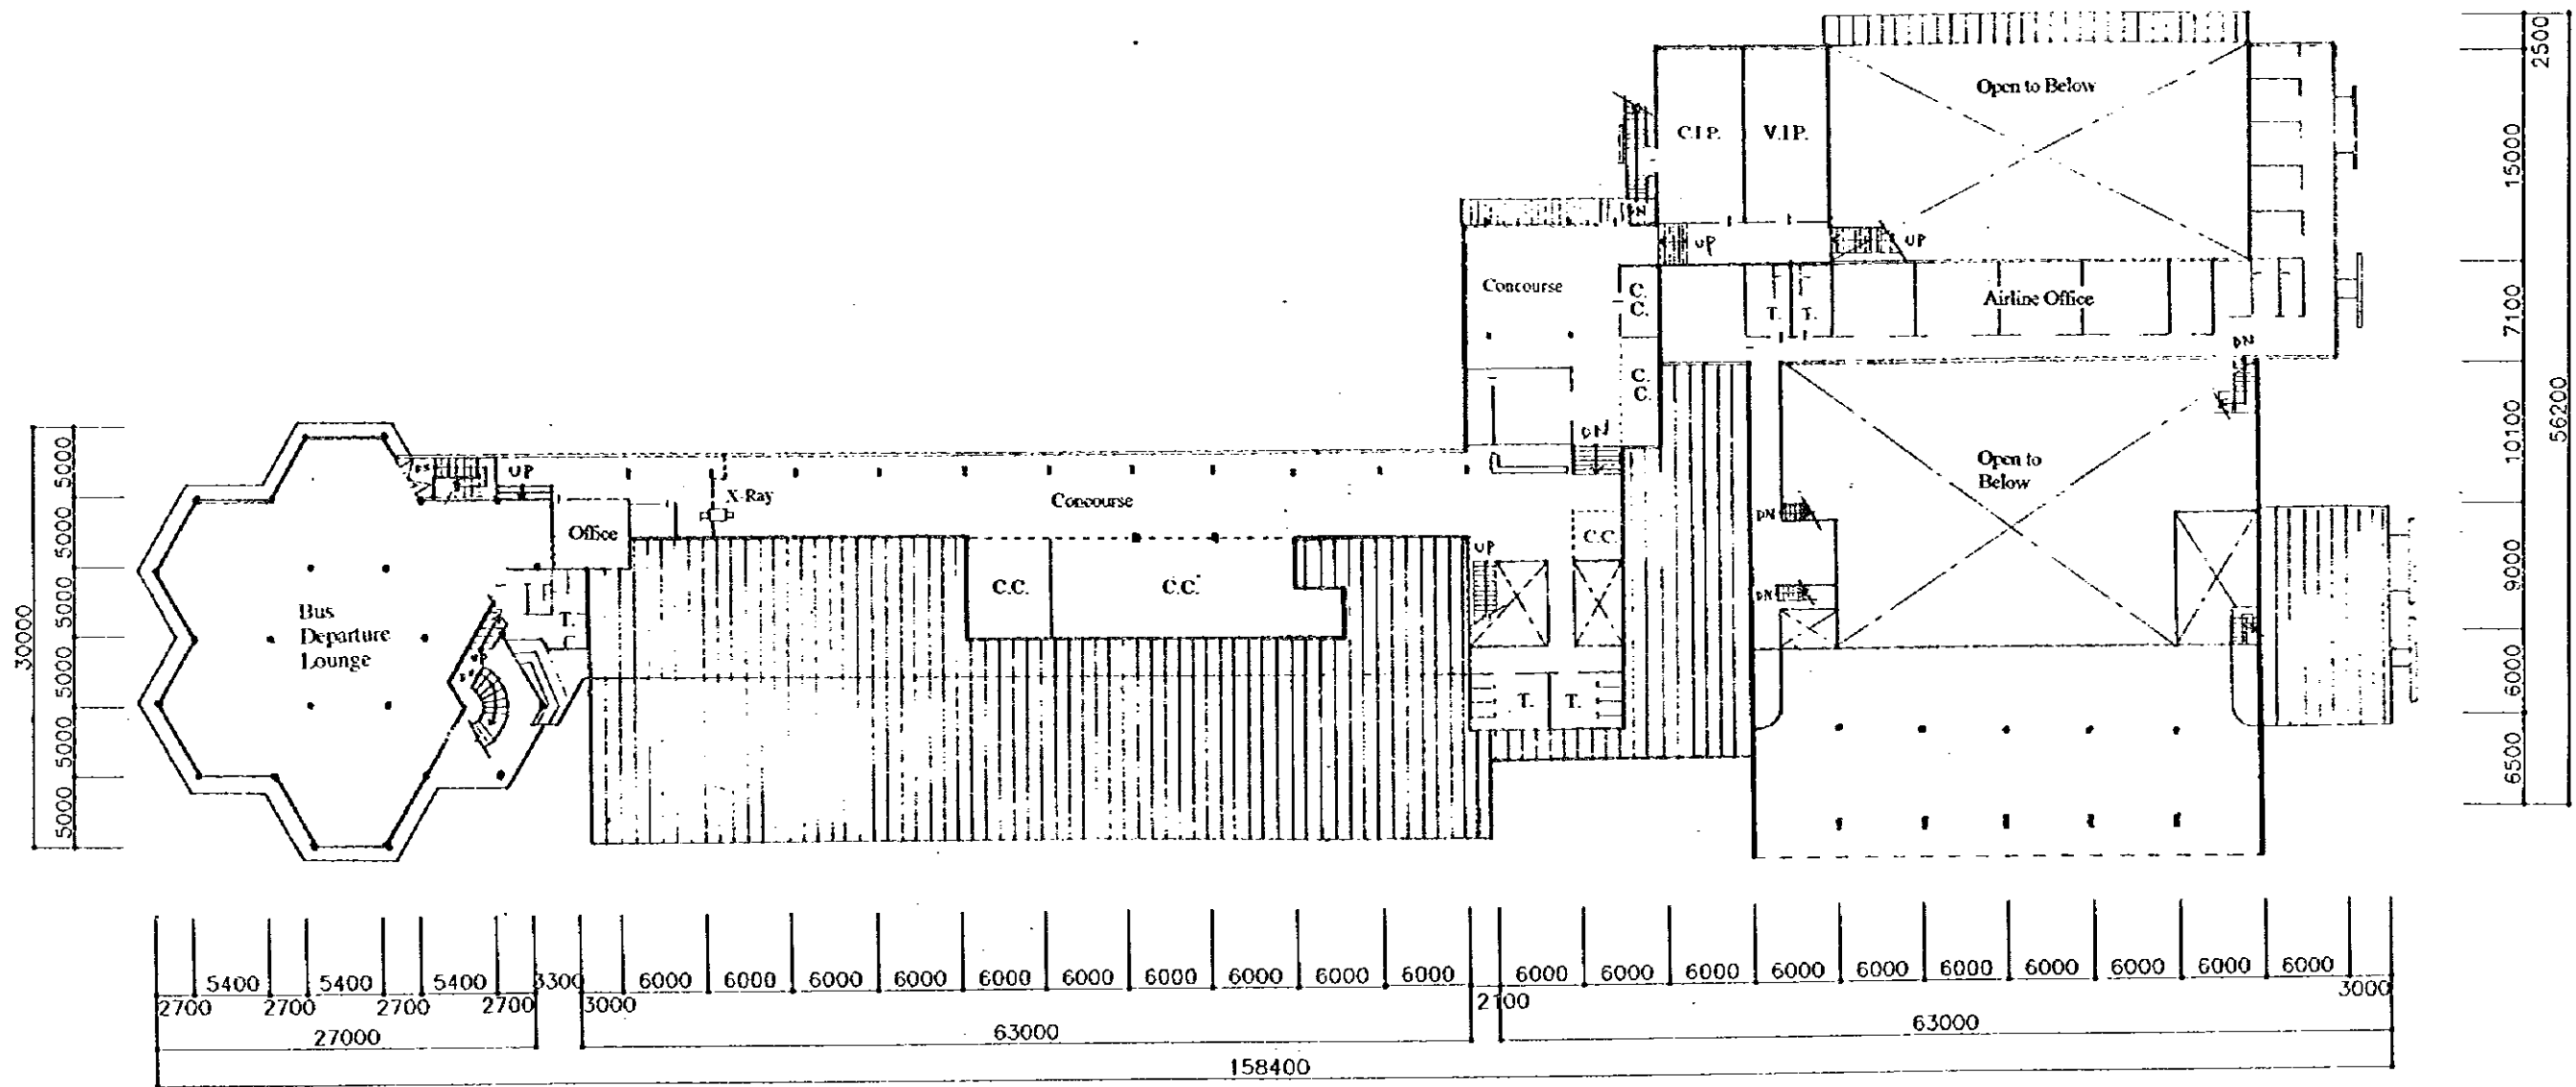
G2, G3 and Lounge Buildings - Second Floor
